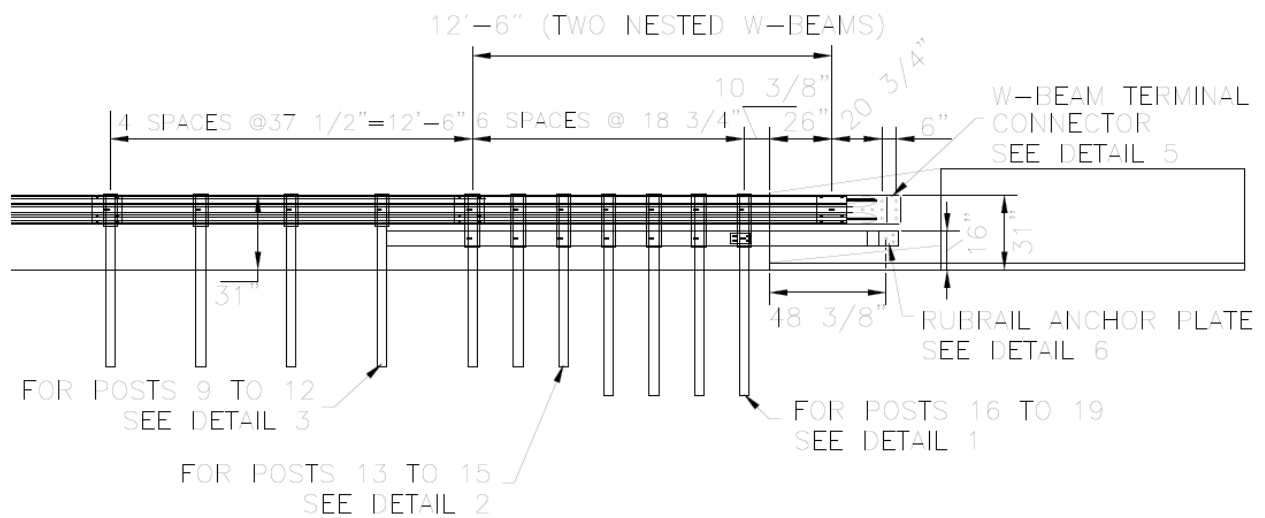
MASH W-Beam Transition to Concrete Barrier
